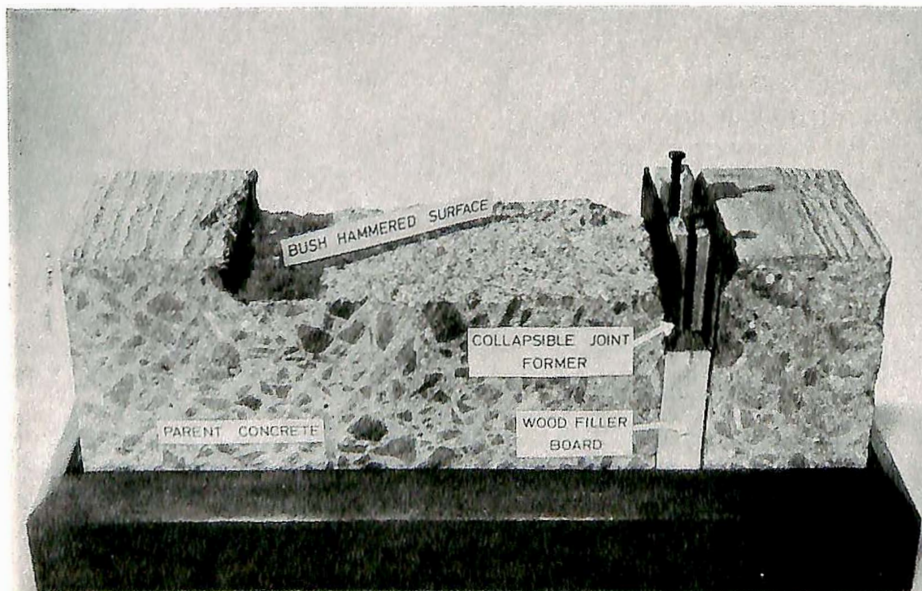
Collapsible joint former used when patching an area adjacent to a joint.
